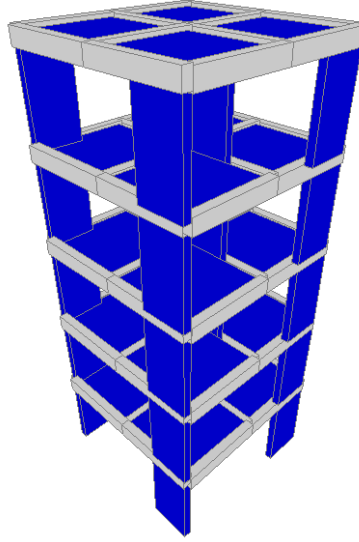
3D Finite Element Model of Reinforced Concrete Structure
